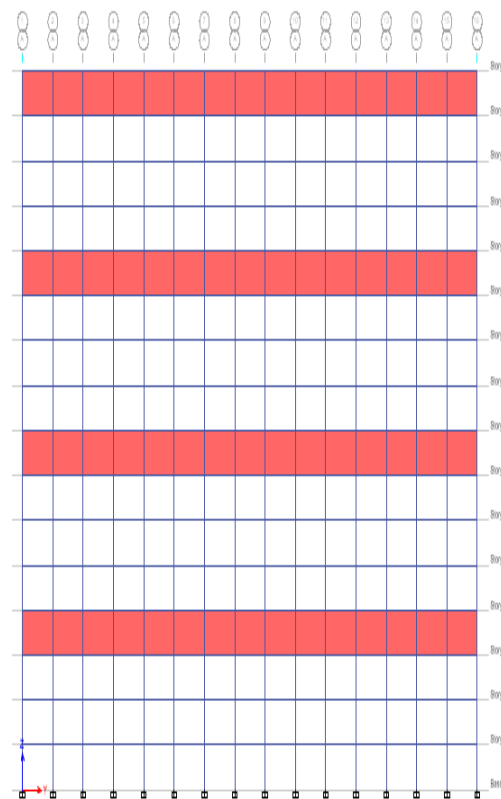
Elevation View of Rectangle bare frame With Shear Wall (Case 3)
